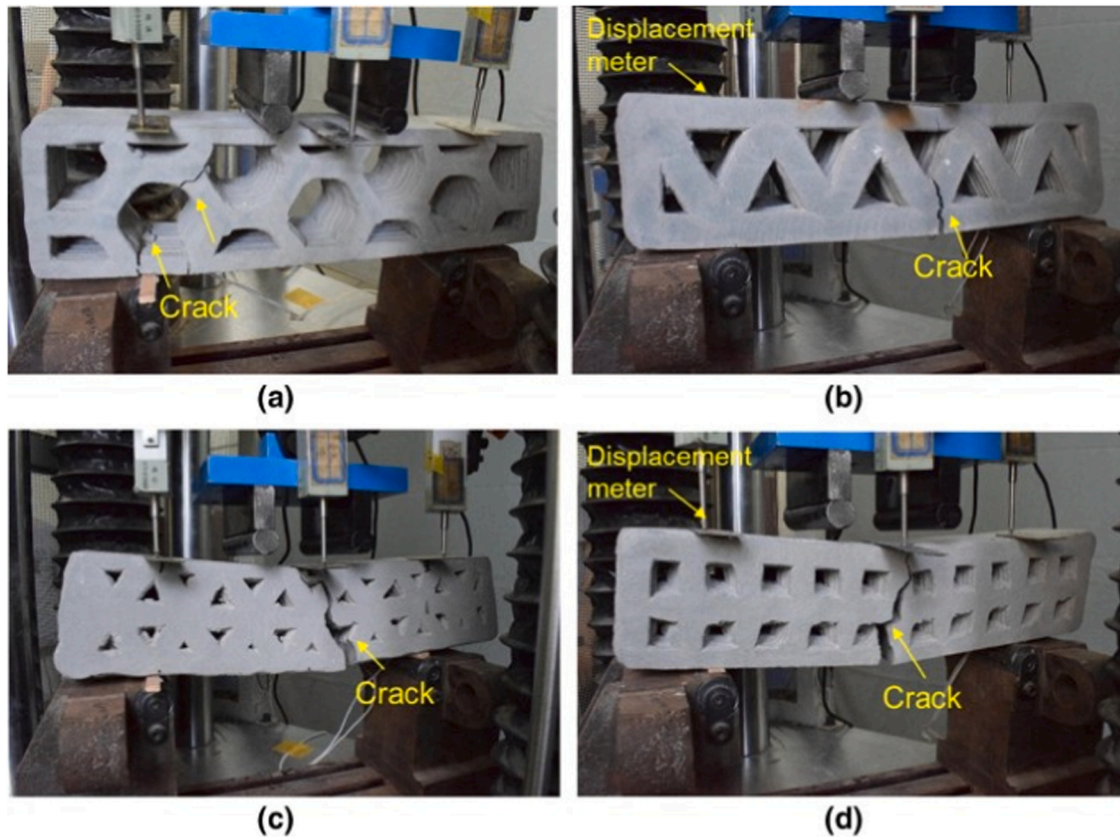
Example of lattice structures in 2.5D printed concrete beams [62].
